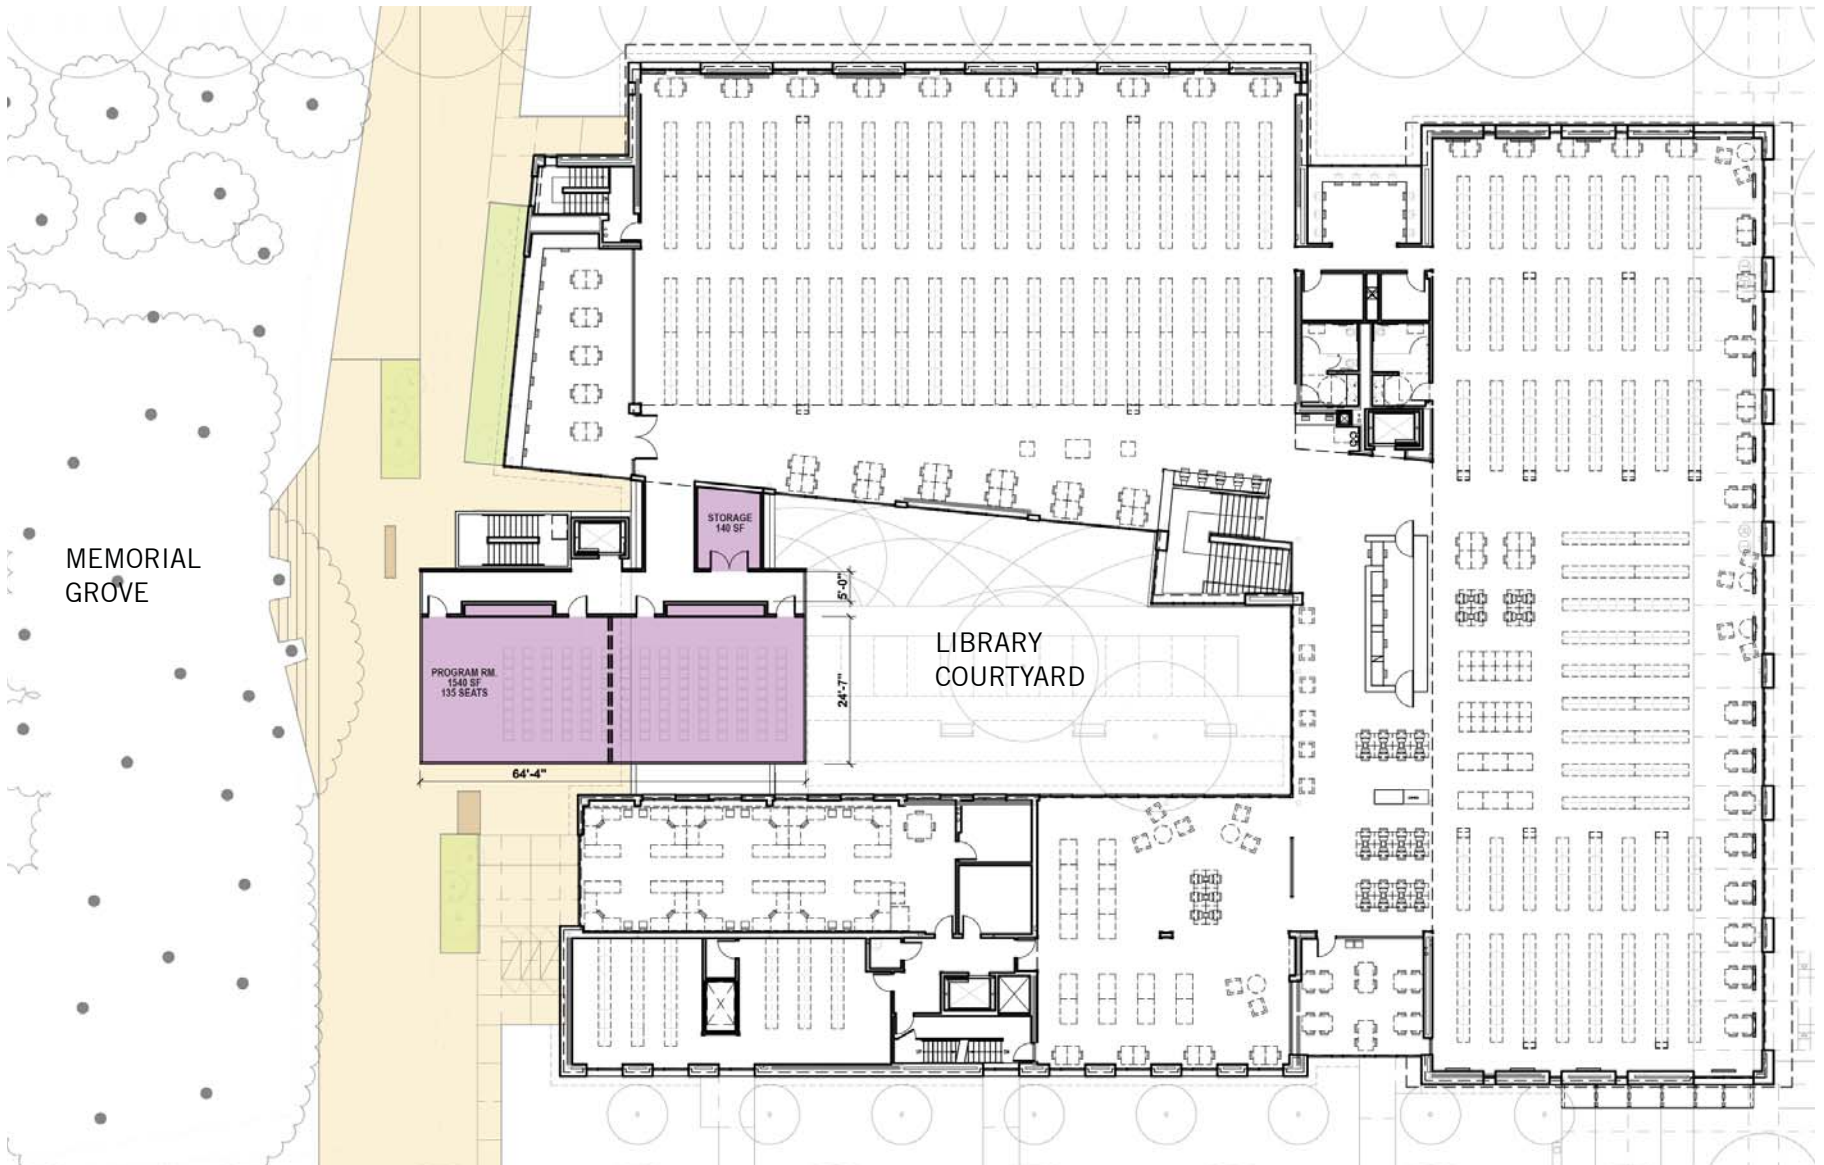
Conceptual second floor plan of the 'Perch' addition
